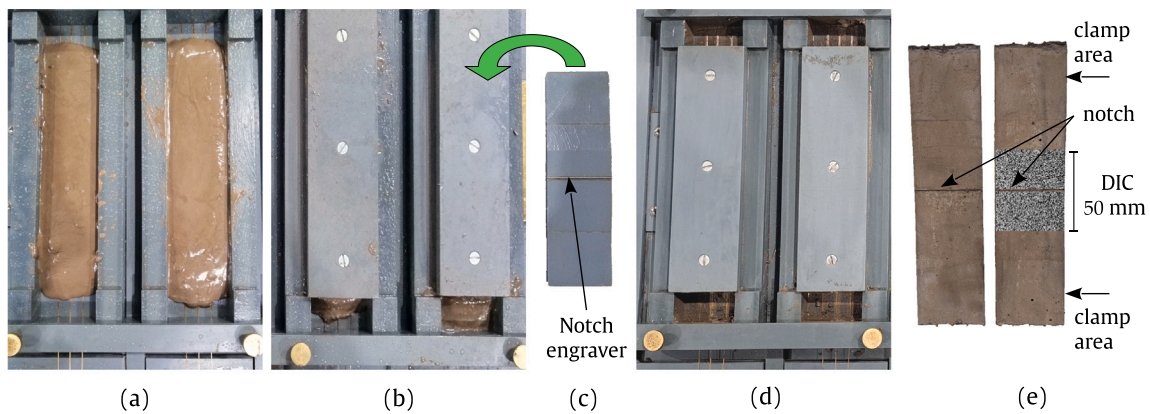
Details of the manufacturing process of the specimens for double-sided pull-out tests.
